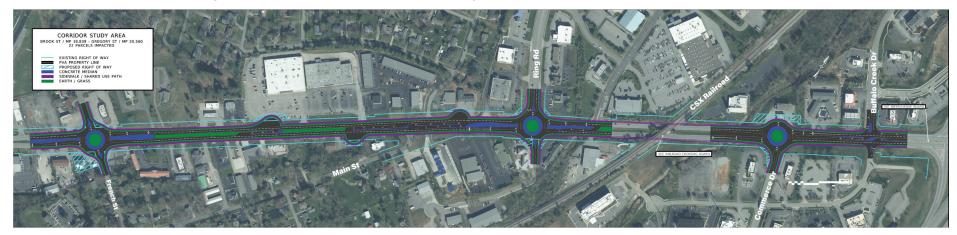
Roundabout Corridor that does not provide a New Connection to Buffalo Creek Drive
